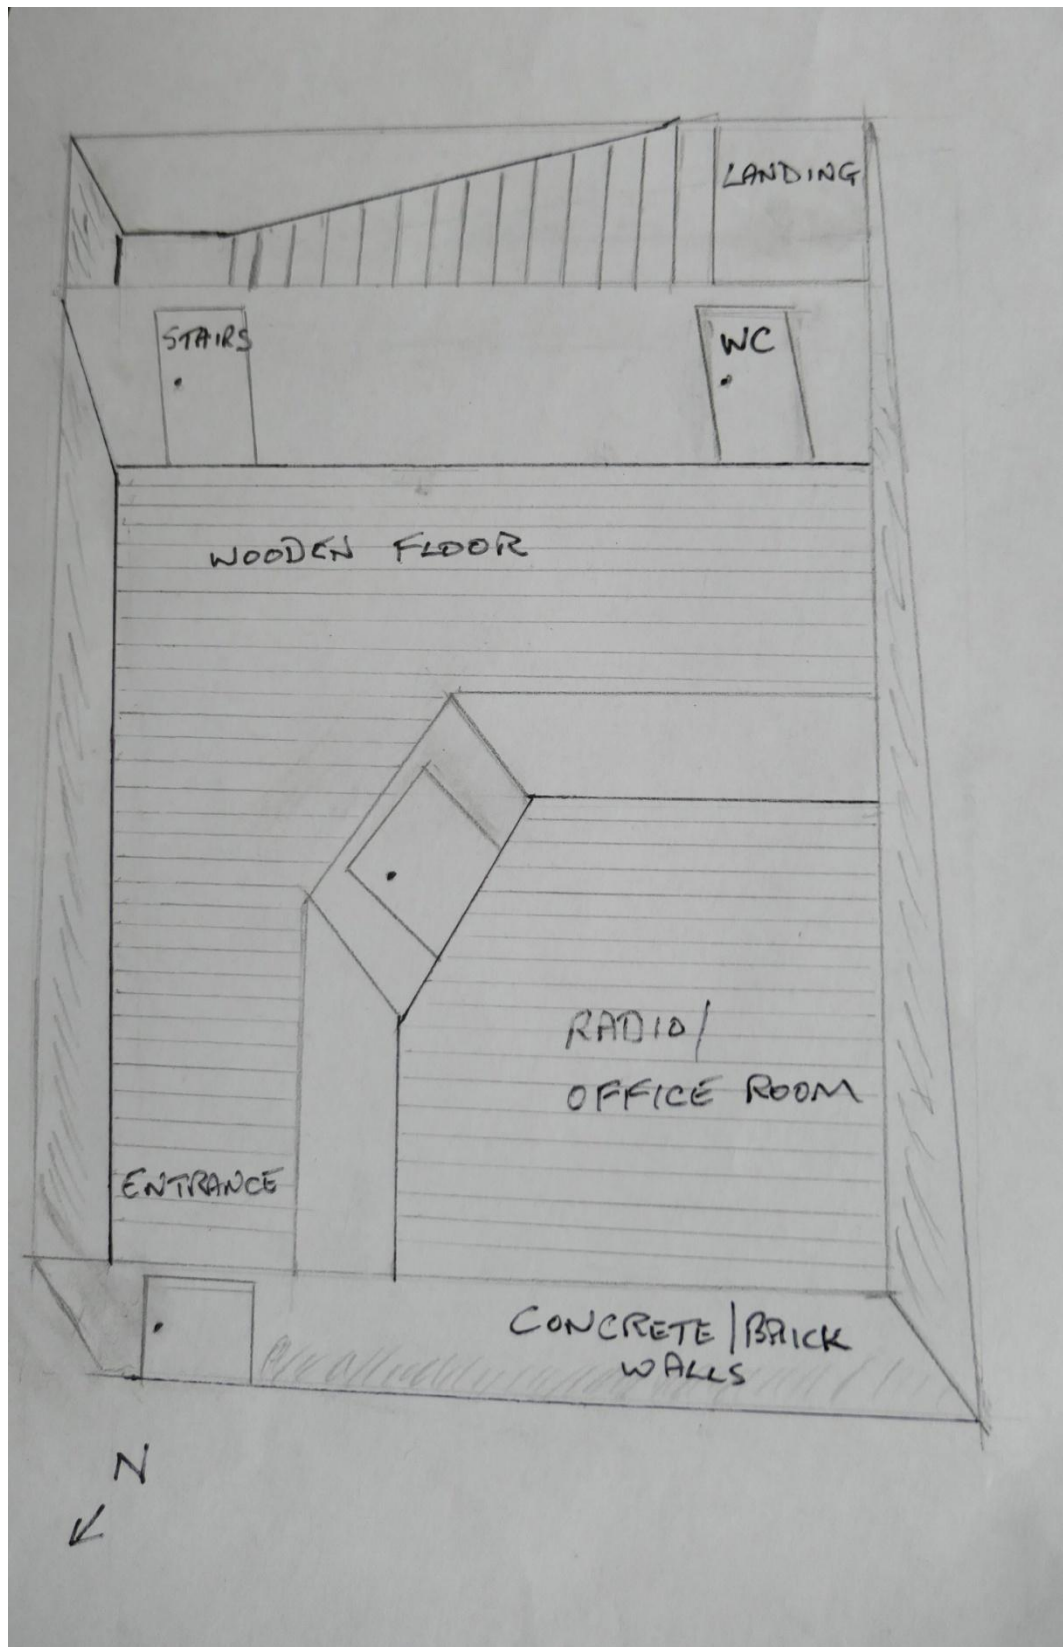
Possible layout for ground floor of tower using noted foundations. (C Westwood).
